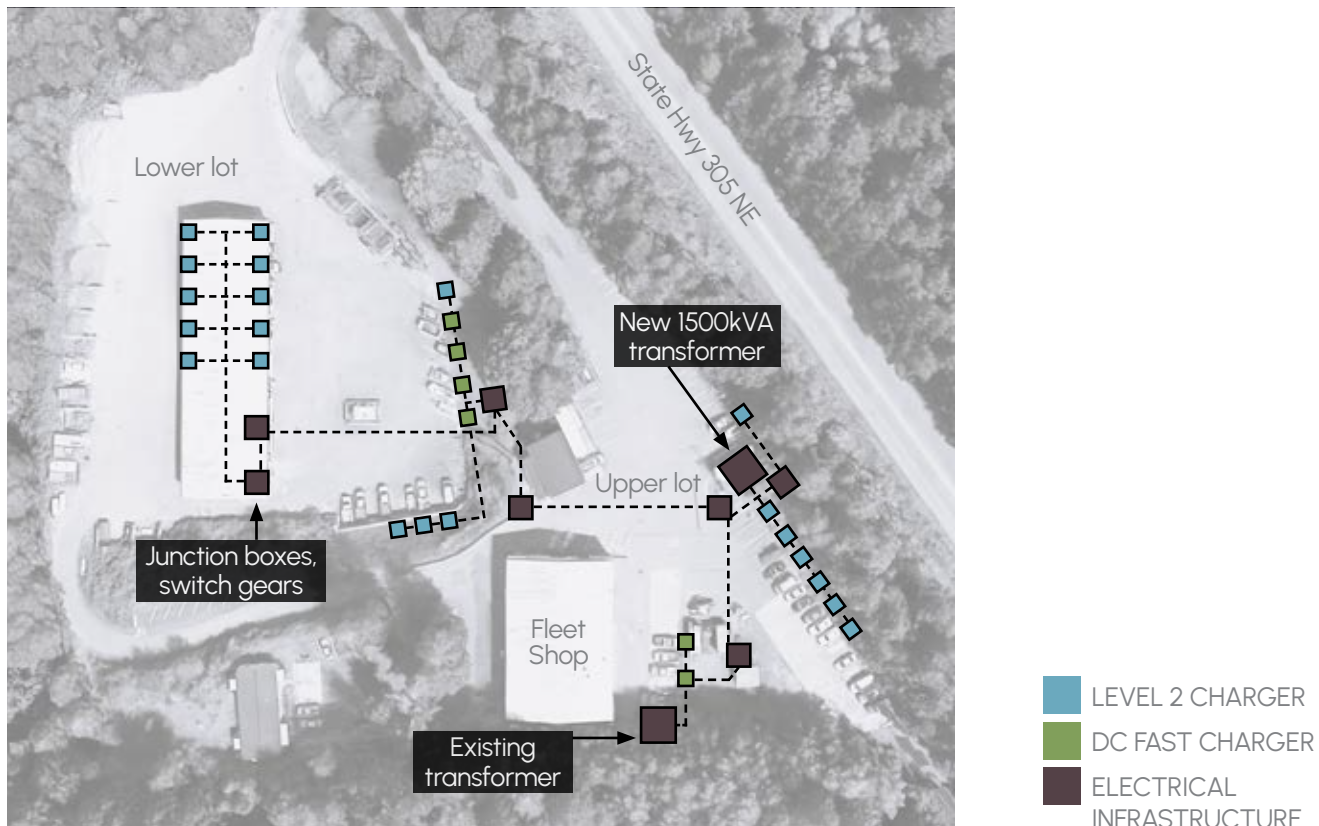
Proposed Public Works electrical equipment and infrastructure layout
